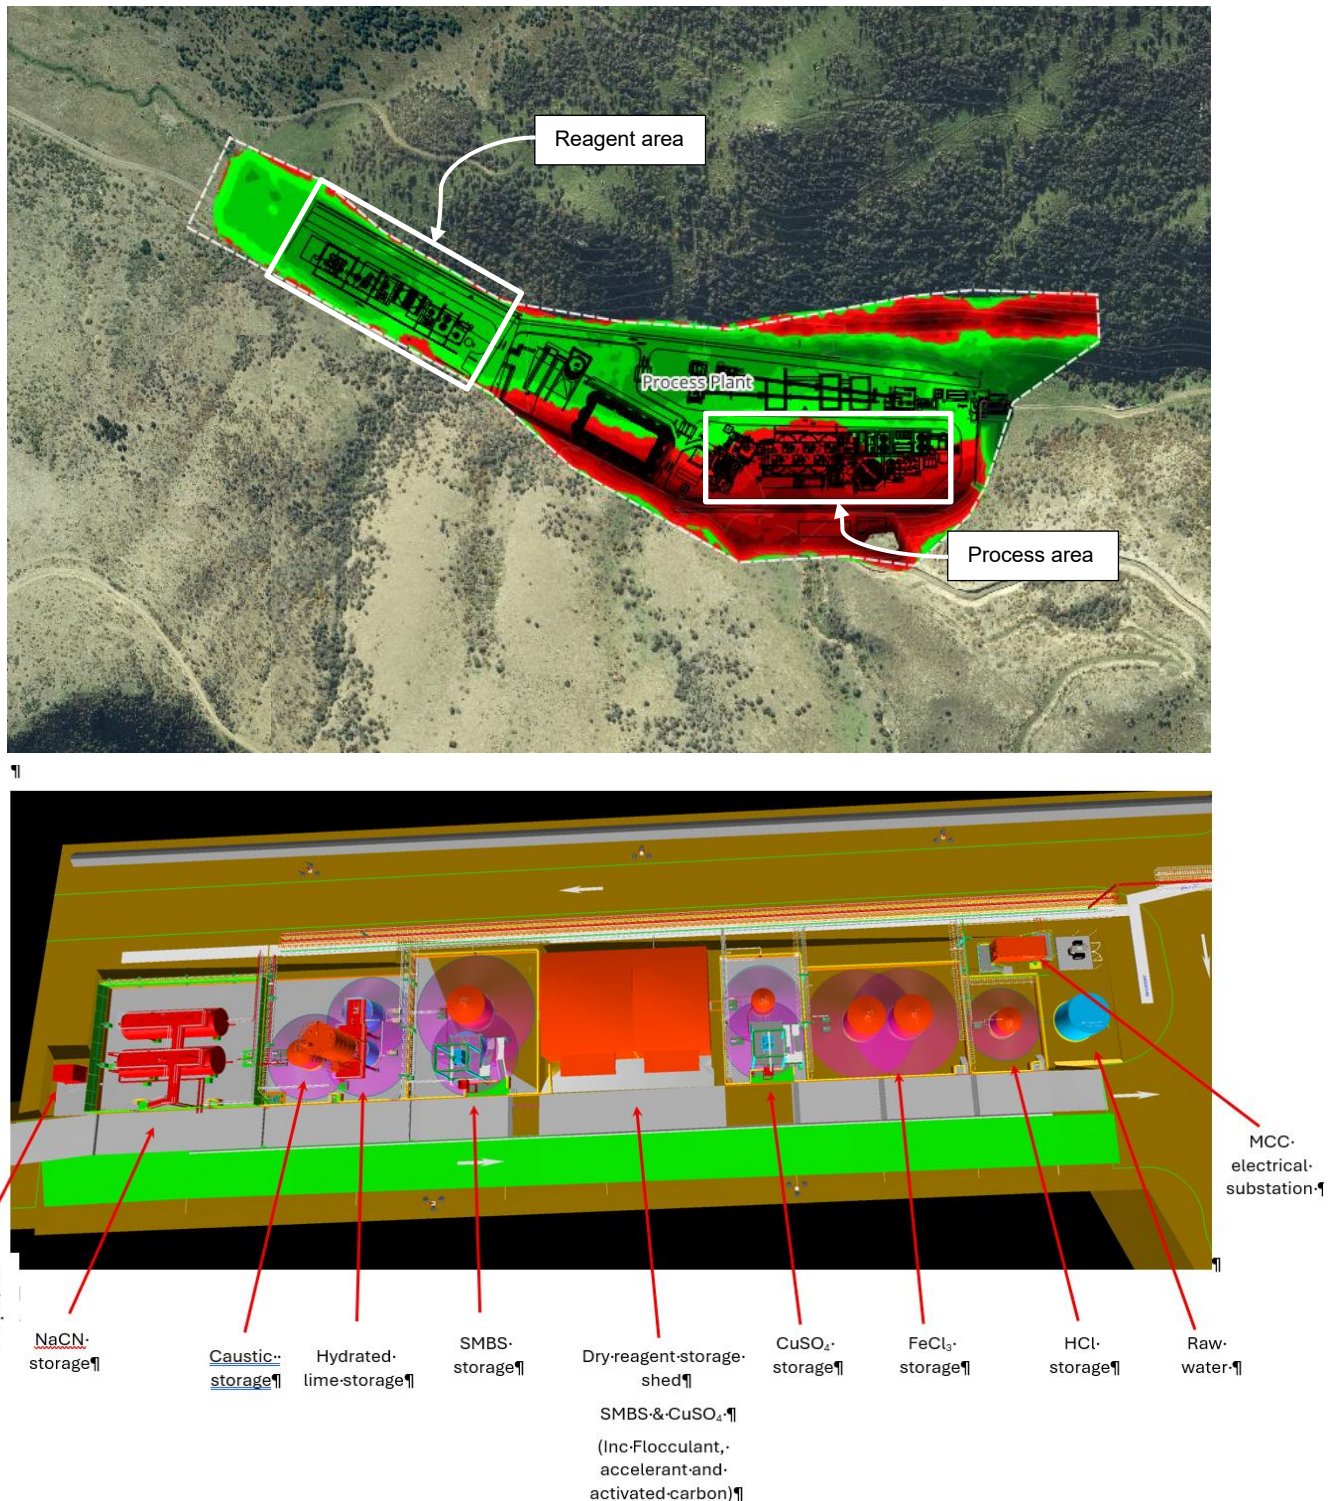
Process Plant Layout (as of June 2026). Images provided by MGL
